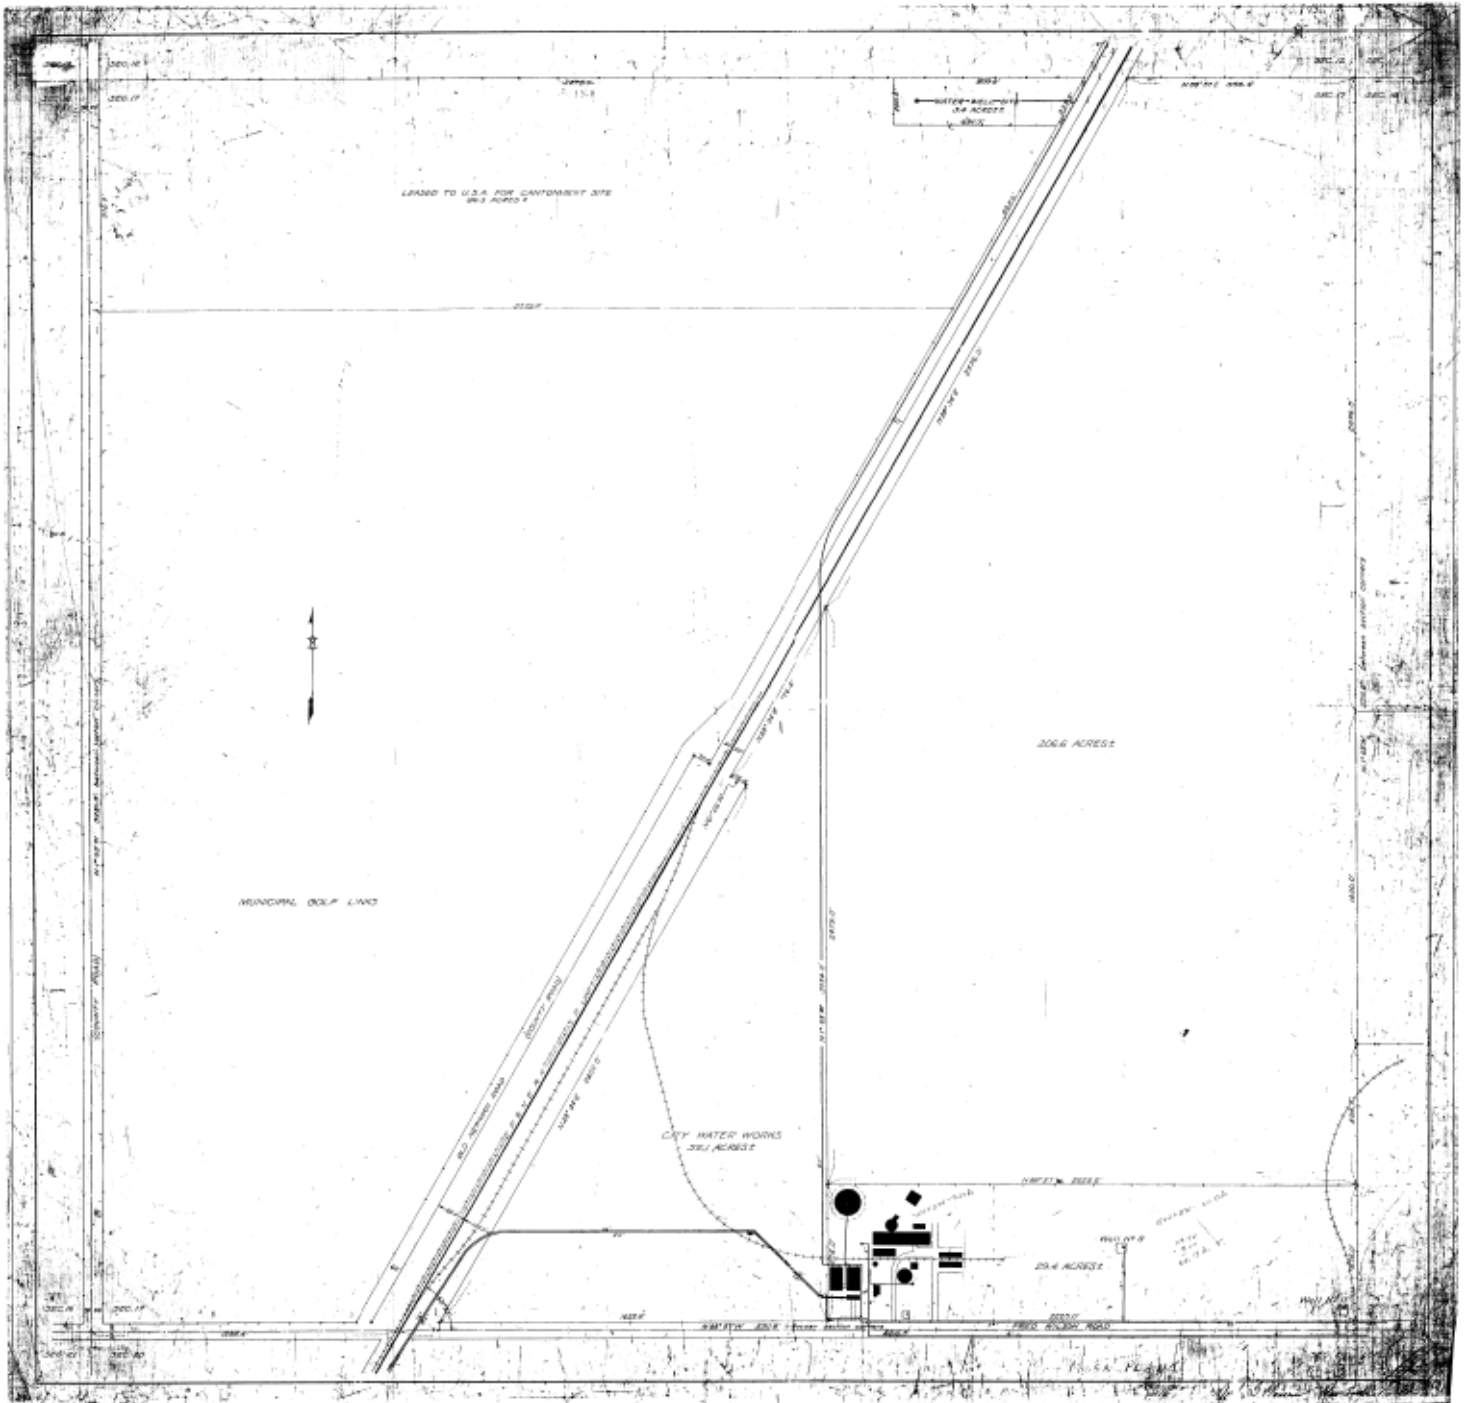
Site plan, ca. 1942. Excerpted from Classen's Mesa Water Booster Station drawings.
